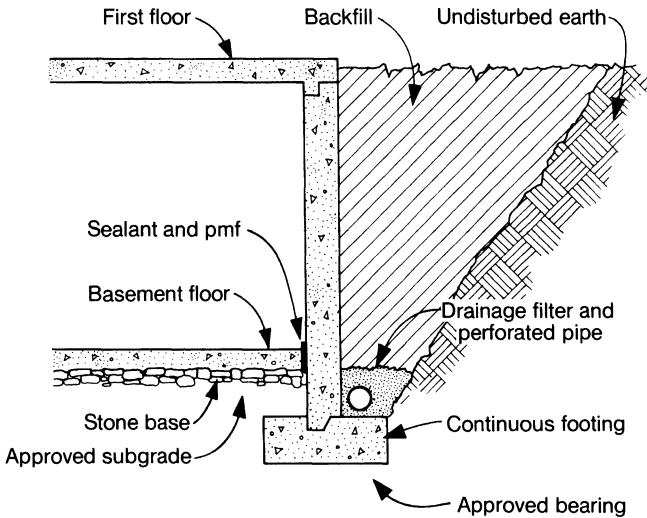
Typical detail of a cast-in-place basement wall.
